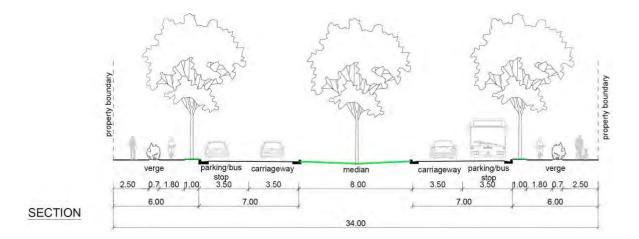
Cross Section – Commercial Road and North South Boulevard
